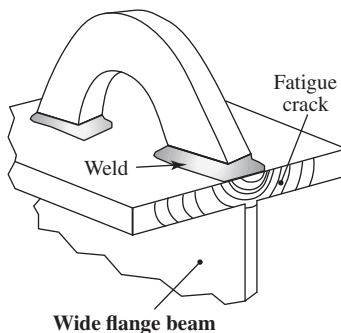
Fatigue fracture at a weld toe. (After Larrainzar et al., 3)
